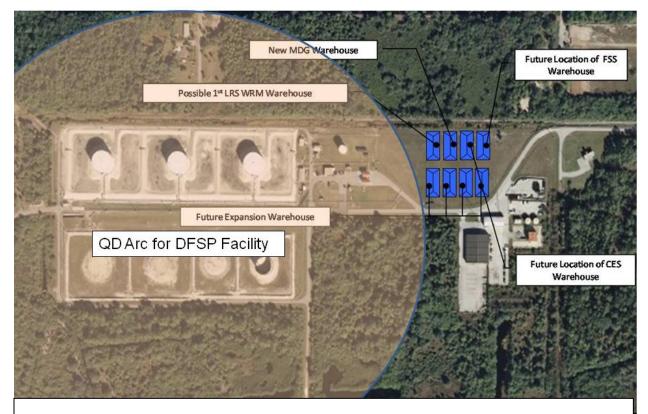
Site plan for proposed warehouse complex showing QD arc for the DFSP area. All new facility construction would be completed outside of the QD arc for DFSP.
